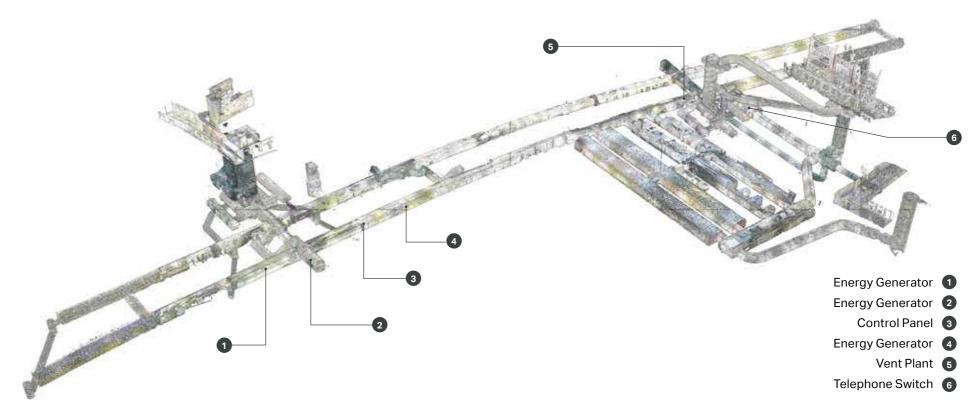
'Point-cloud' survey diagram highlighting the existing plant that could potentially be retained and woven into the historical narrative of the Tunnels
